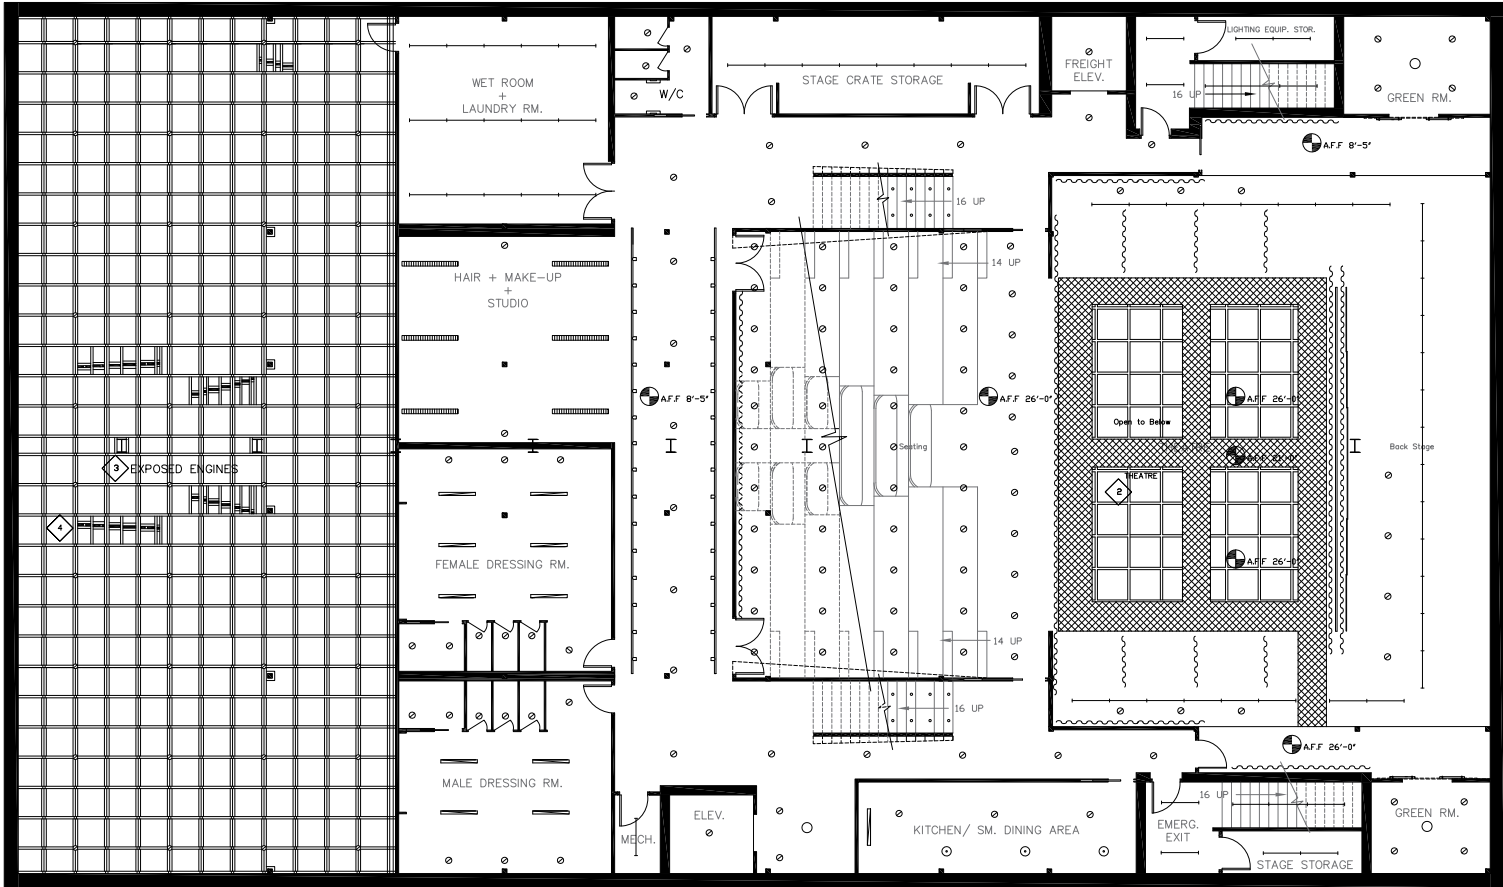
Reflected Ceiling Plan: First Floor. Images by author.
